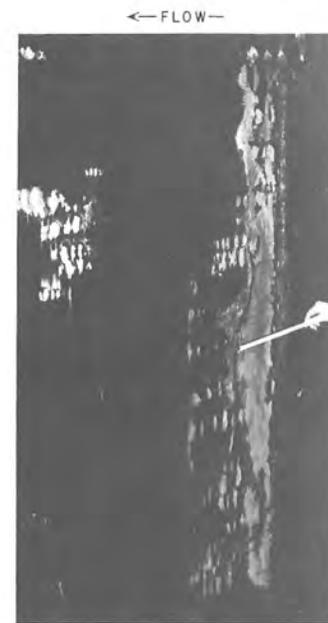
EXTENT OF SIDEWALL DAMAGE
